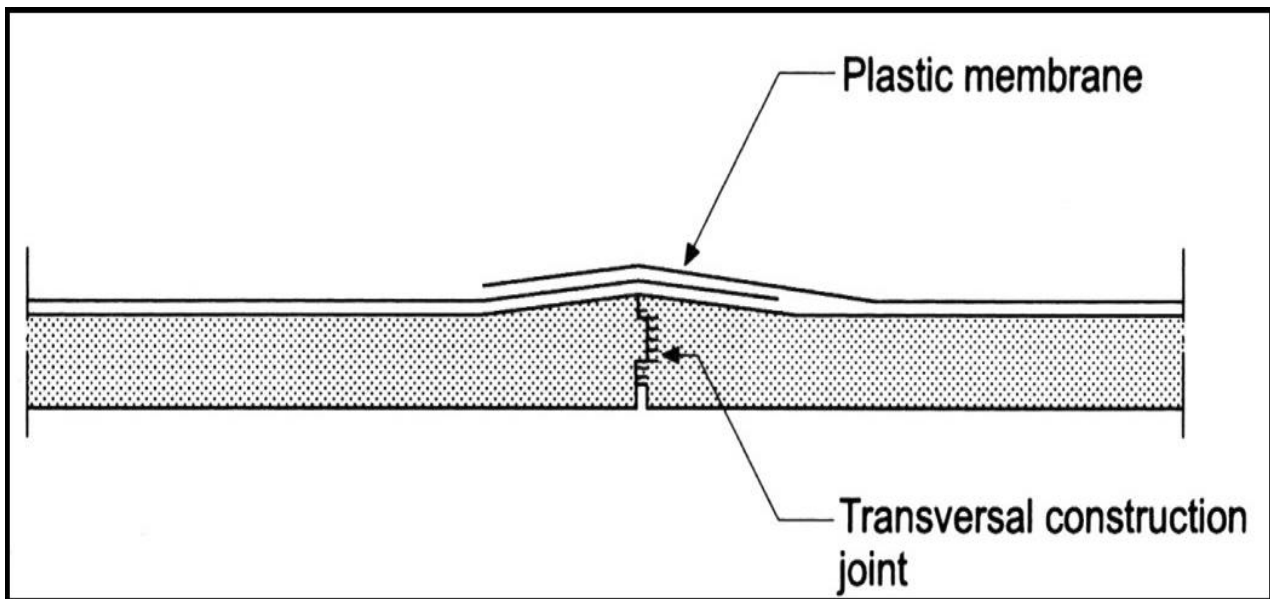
4 Water proofing and construction joint in free span concrete arch.
